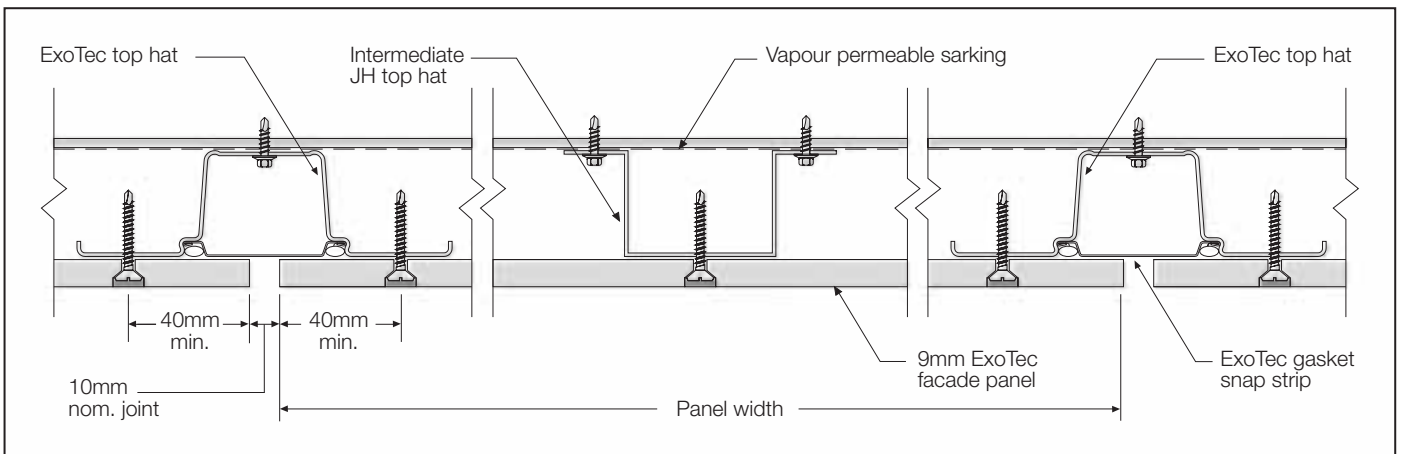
TOP HAT AND PANEL FIXING DETAIL
